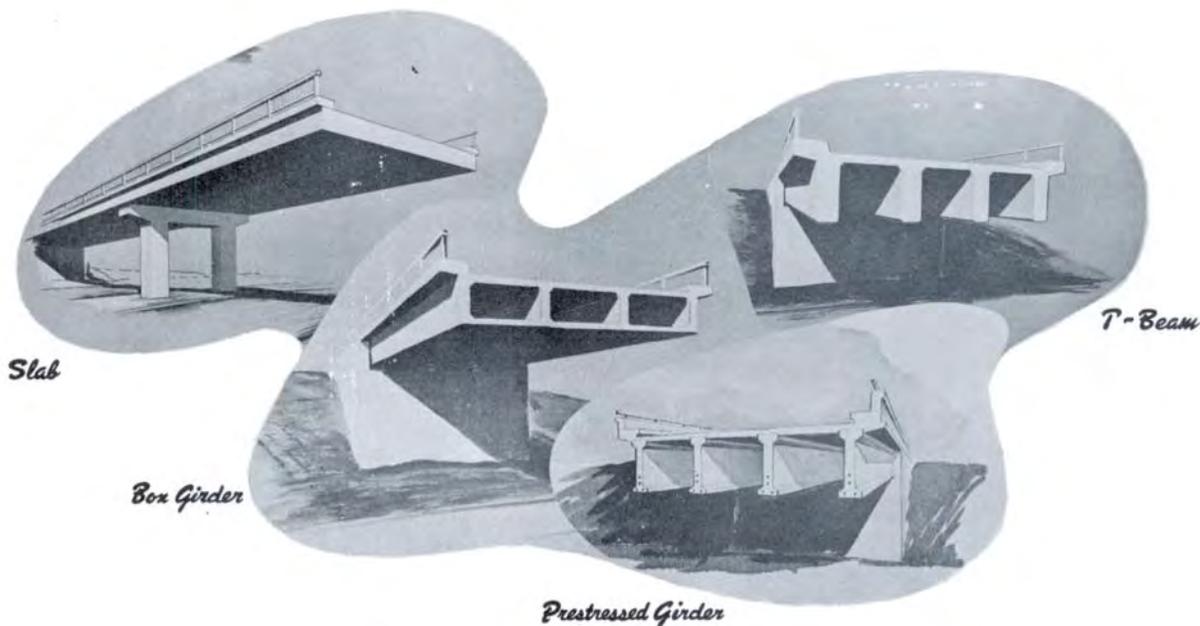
Concrete Bridge Types, Division of Highways Bridge Planning and Design Manual, September 1958.
